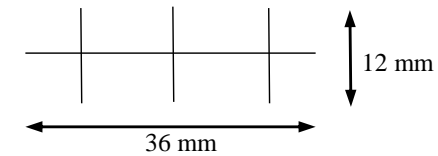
(c). Geometrical Dimension of PVC Coated Welded Wire Mesh for Different Interlocking Schemes
